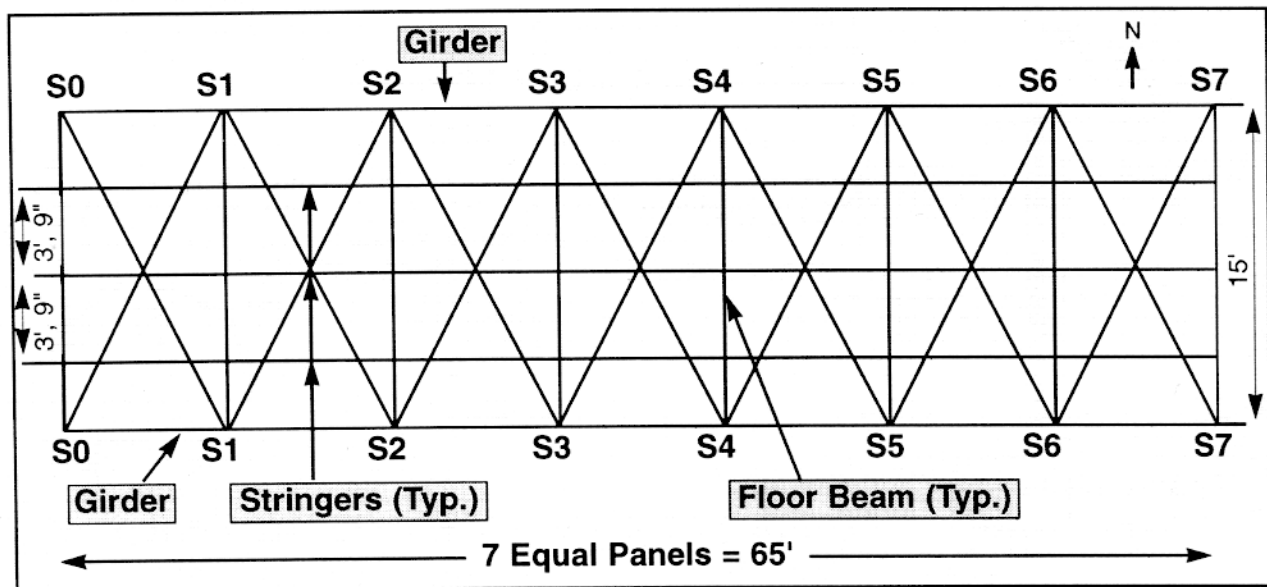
Union Pacific's Through-Plate-Girder Bridge near Frankfort, Kansas
